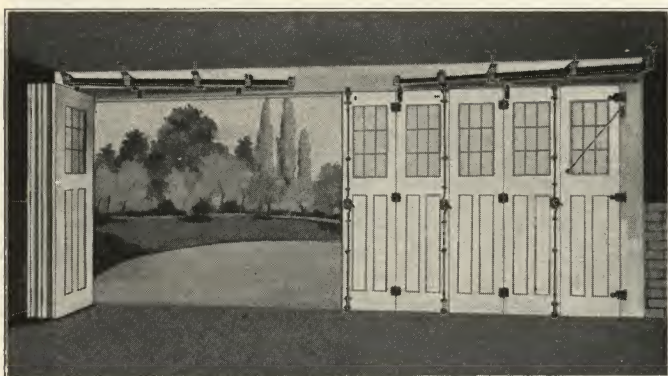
Illustration shows In-Opening Set No. 435-B10-31. Doors are hinged to jambs with 311 offset hinges. Where 232 or 33 track sets are used 1038 offset hinges are furnished instead of the 311. All Out-Opening sets are furnished with butts at jambs.
